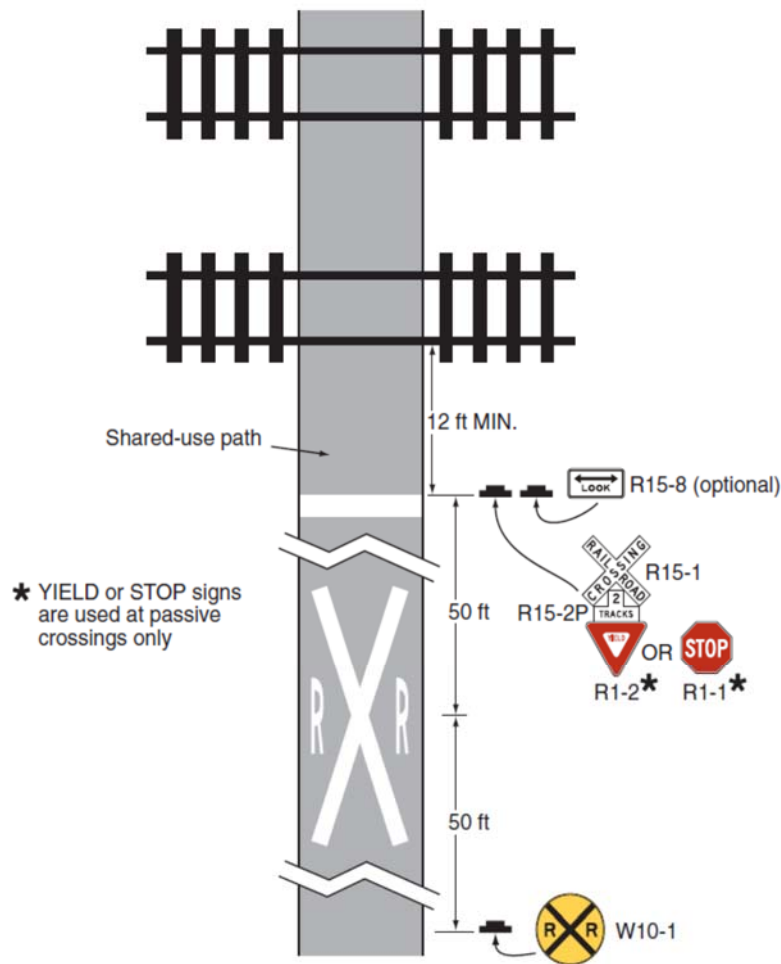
Example Signage and Markings at a Shared Use Path Crossing of a Rail Road (49)
